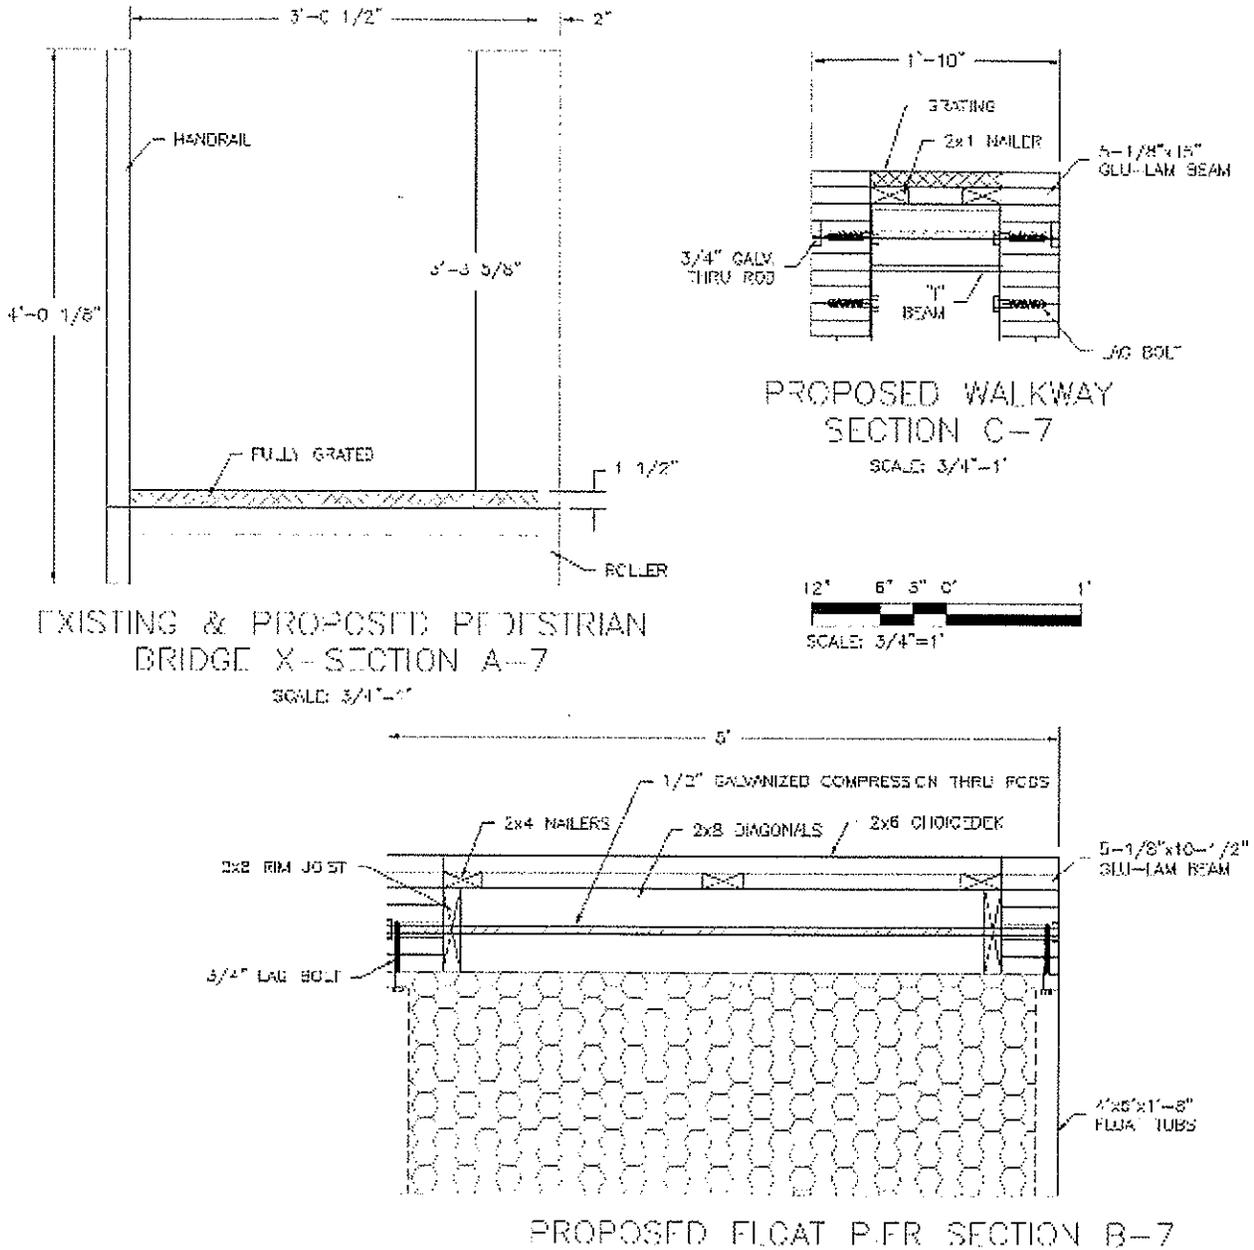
Cross-section views of the proposed Pier D ramp, proposed Pier G2 access walkway, and proposed Pier C and D floats (prepared by Waterfront Construction Inc.).
